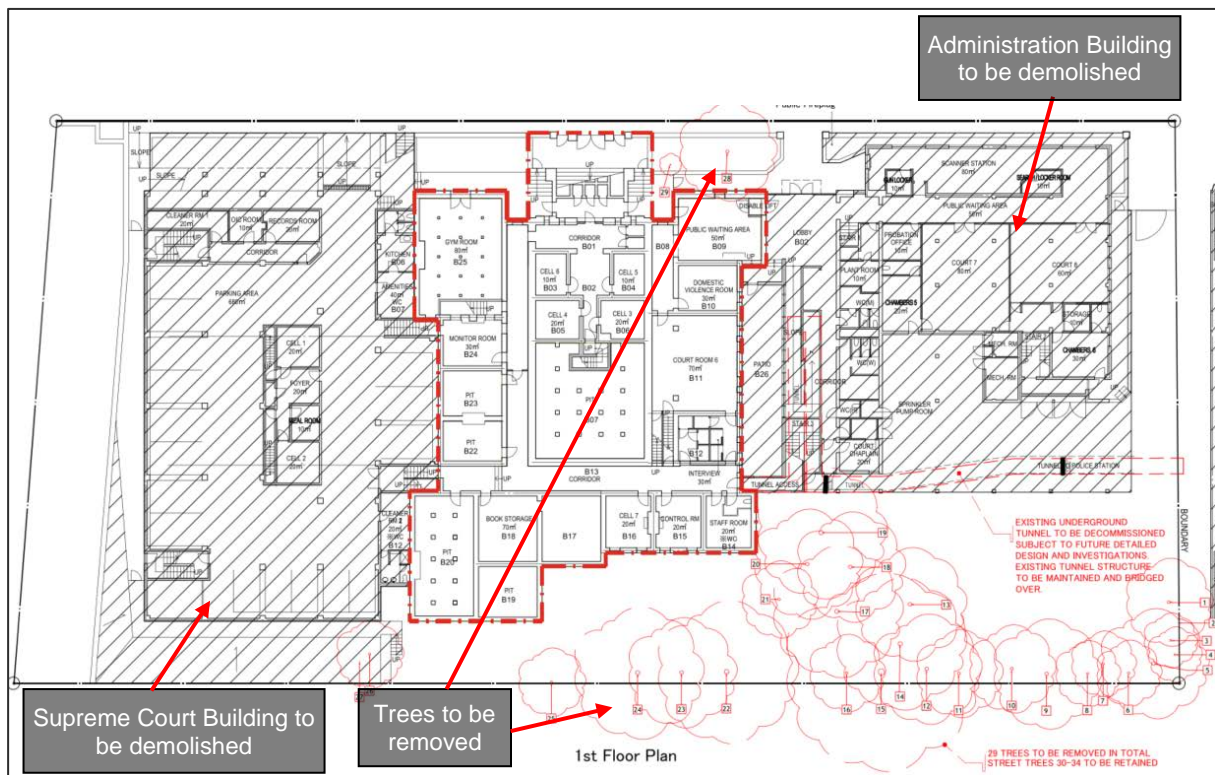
| Demolition plan (areas shown hashed proposed to be demolished) (Source: EIS)
